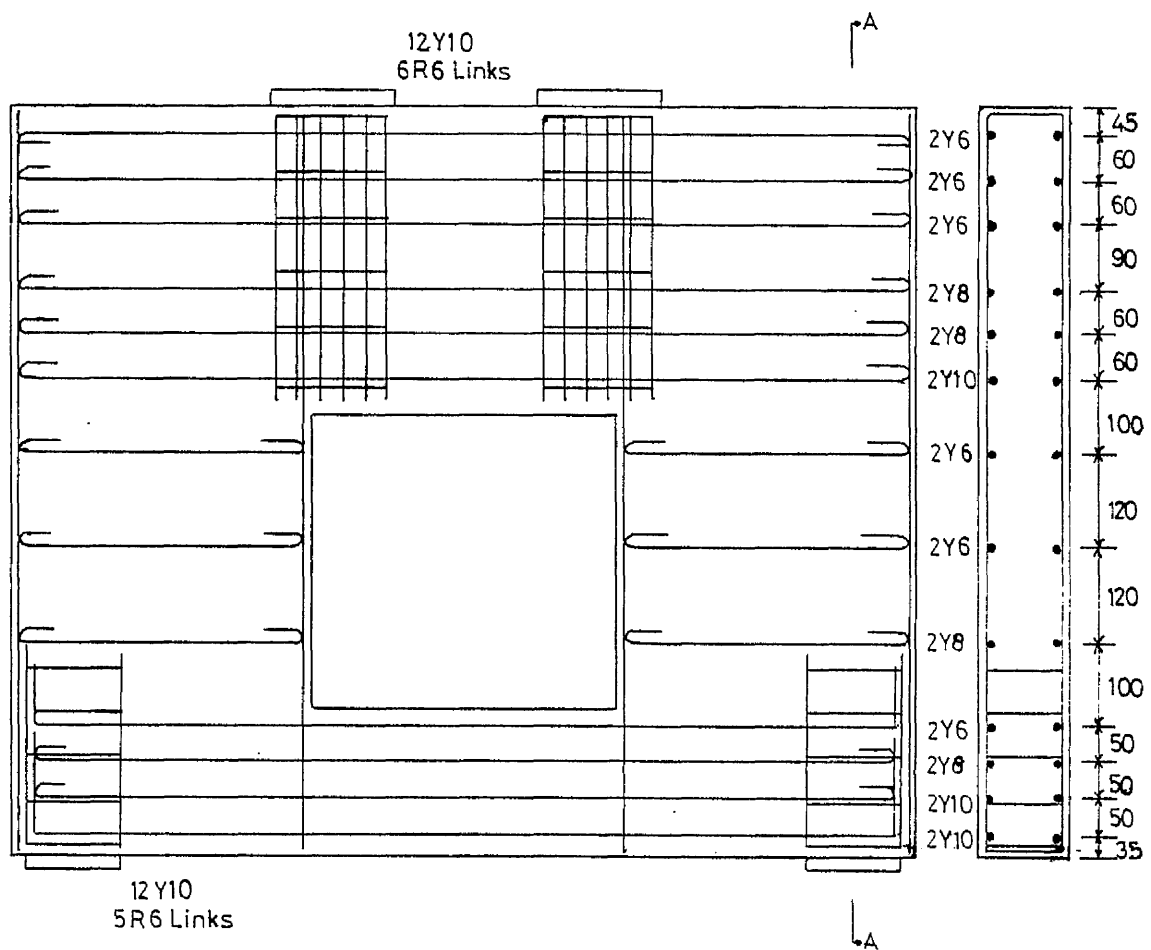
ARRANGEMENT OF REINFORCEMENT FOR BEAM B7. SECTION A-A.
